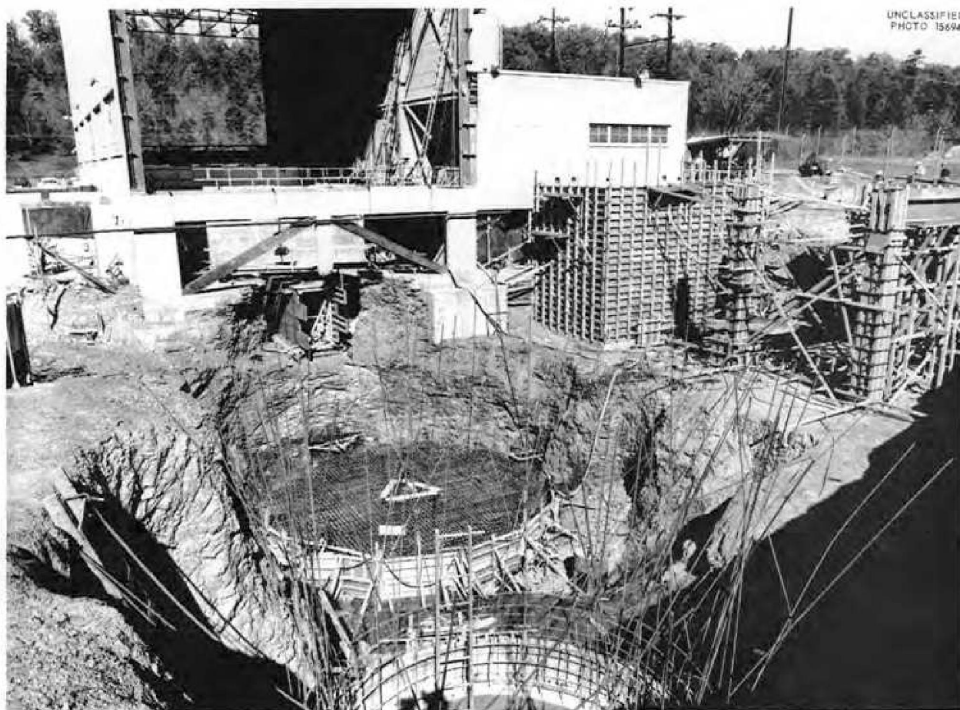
Early Work on Absorber Pit and Cell Foundation.
